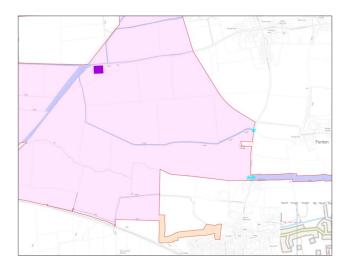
CONSTRUCTION PHASE PARAMETER PLAN - FURTHER DETAIL
